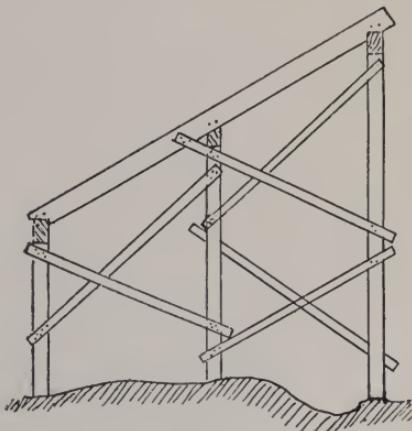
SECTION OF FRAMING OF A 20-FOOT STAND.
